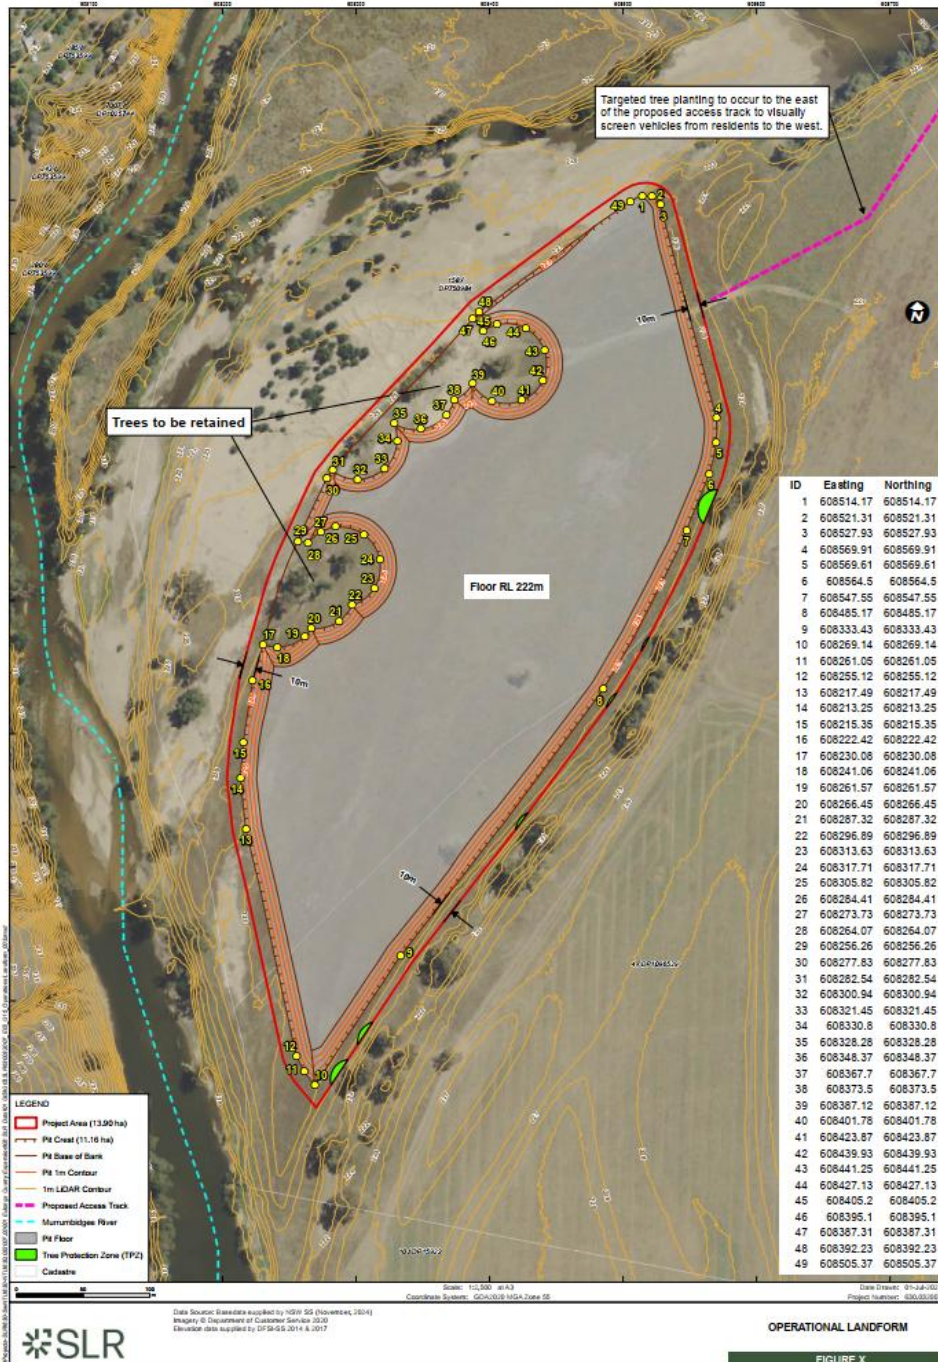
Amended Operational Landform Plan (Source: Submitted 11/07/2025)
